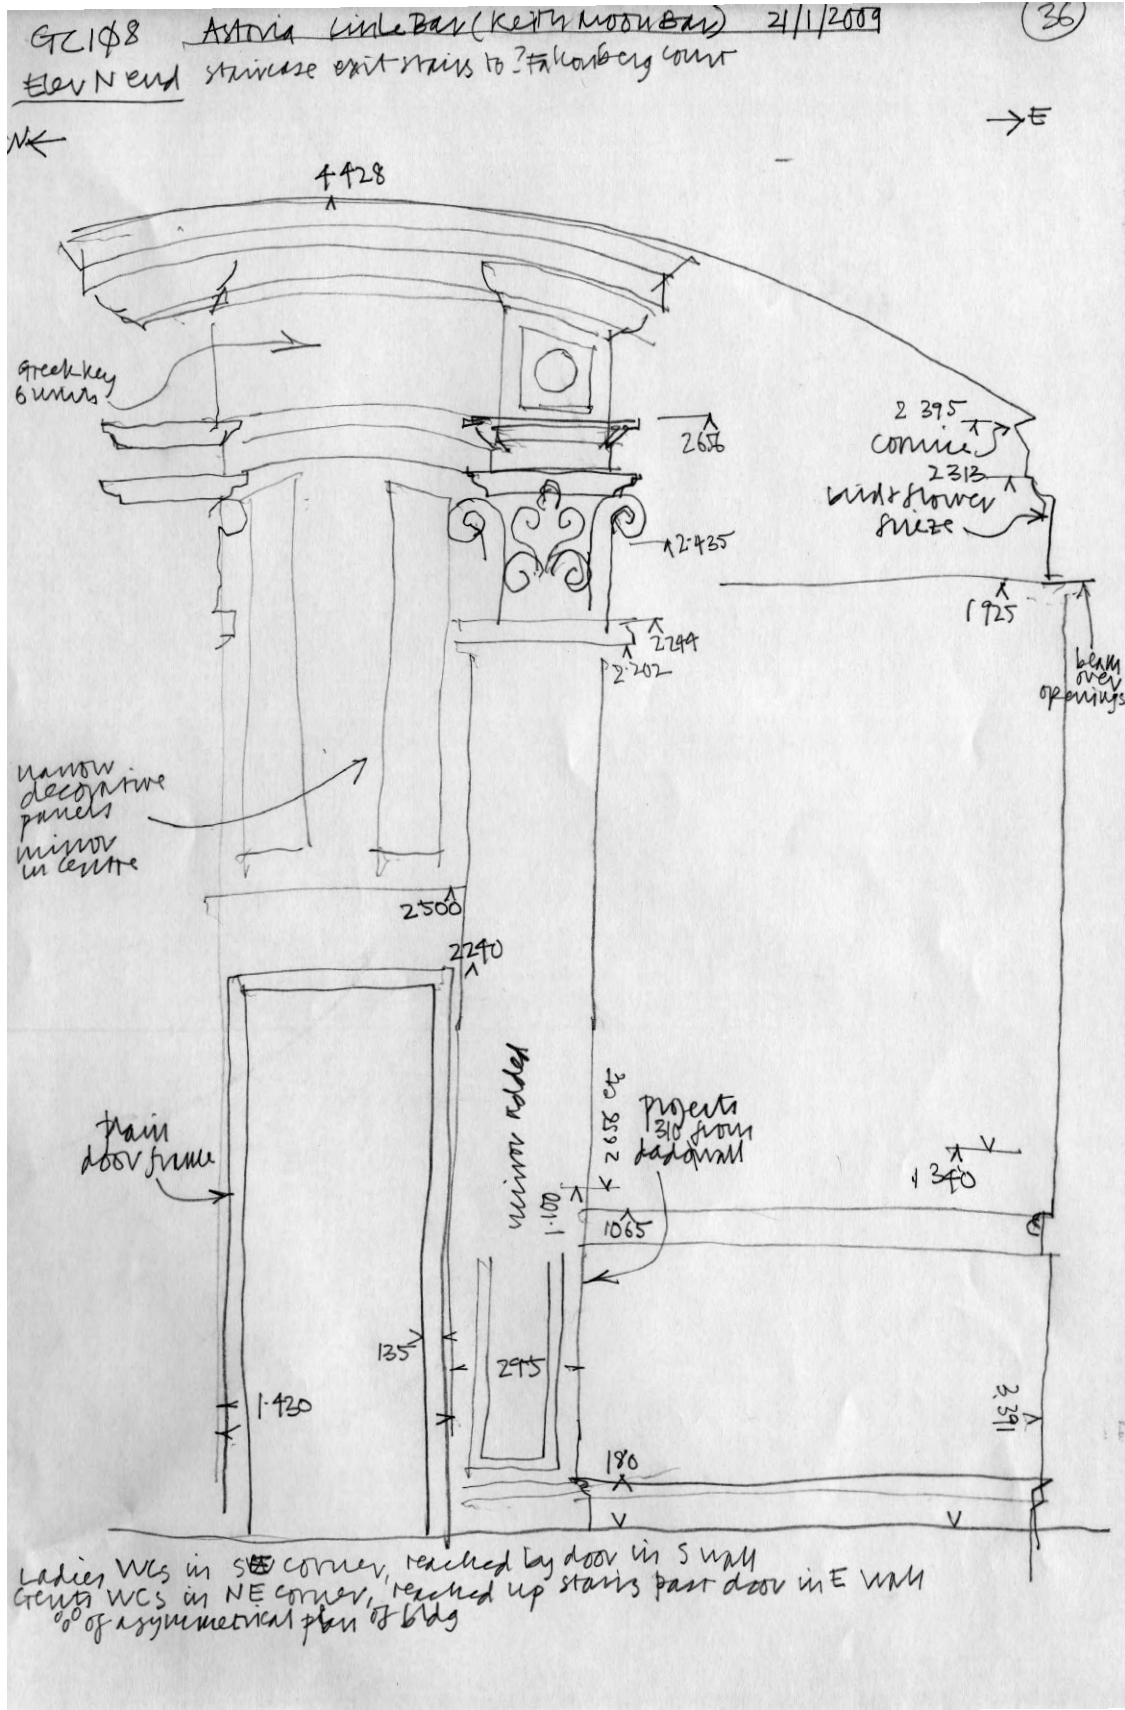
Detail of doorway in Astoria Circle Bar (Building 4)
